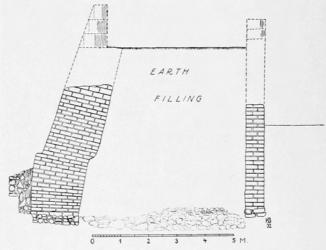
Cut through the Northeast Section of the Fortress Wall. Scale, 1:100
